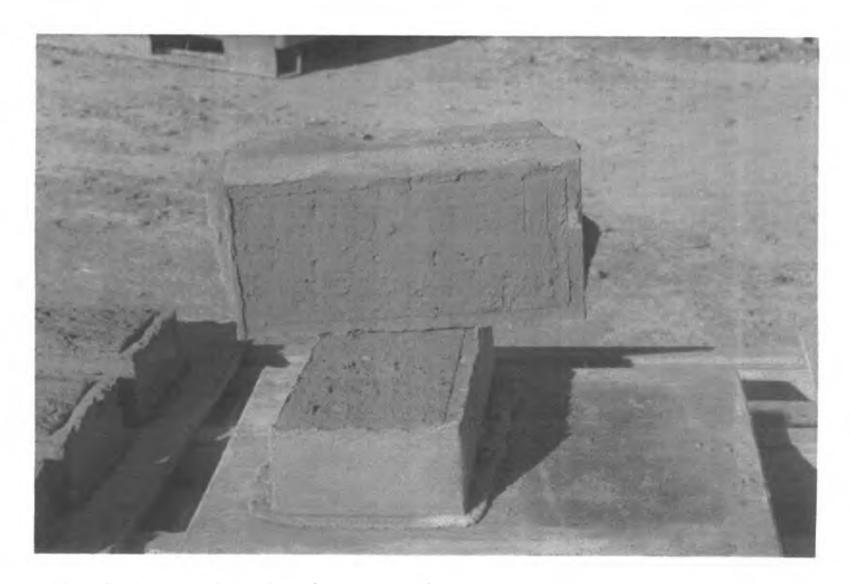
Bricks made using pugged clay, sand moulded using the mould.
